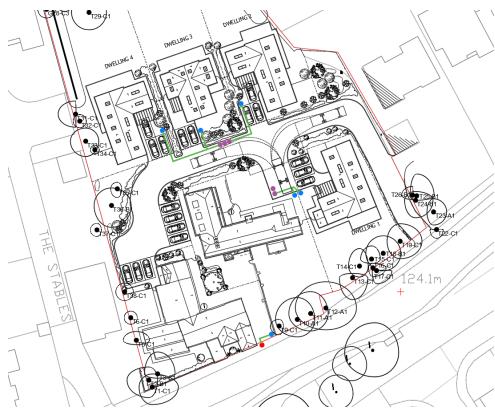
Refuse collection plan, see drawing P-114 Proposed Refuse Plans
